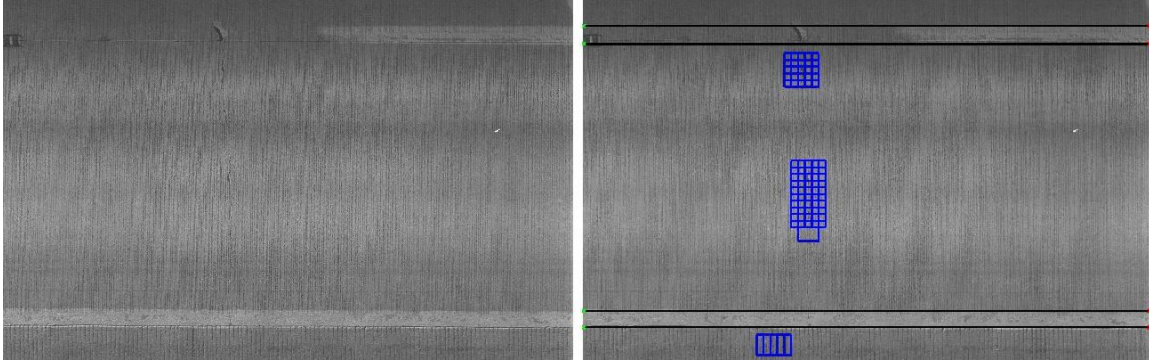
Example 2 of medium-severity concrete crack: raw crack (left) and crack detection (right)
